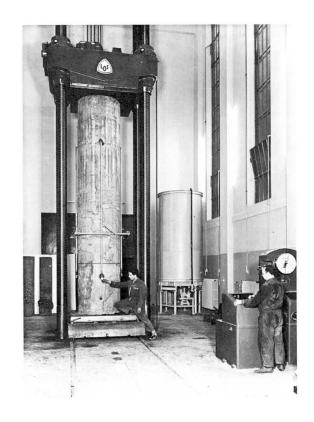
Second series: Reinforcement of prototype pillar. Prototype pillar under test.
